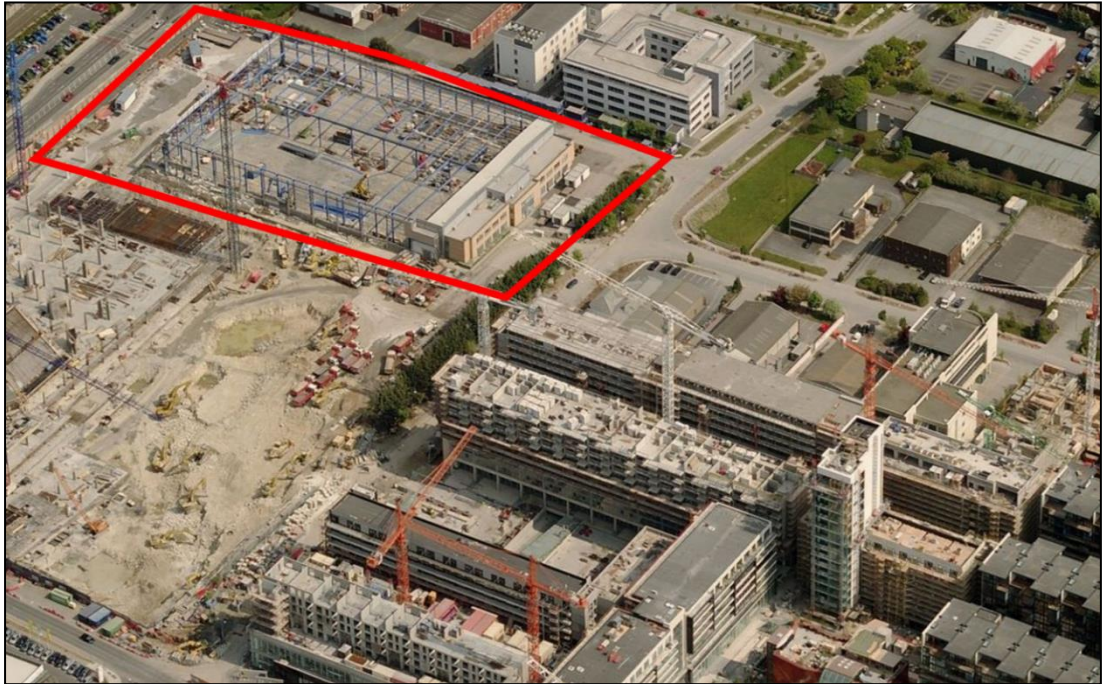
Aerial View of the Subject Site (Outlined in Red) c. 2004/2005 Prior to the Construction of Rockbrook Phase I.
